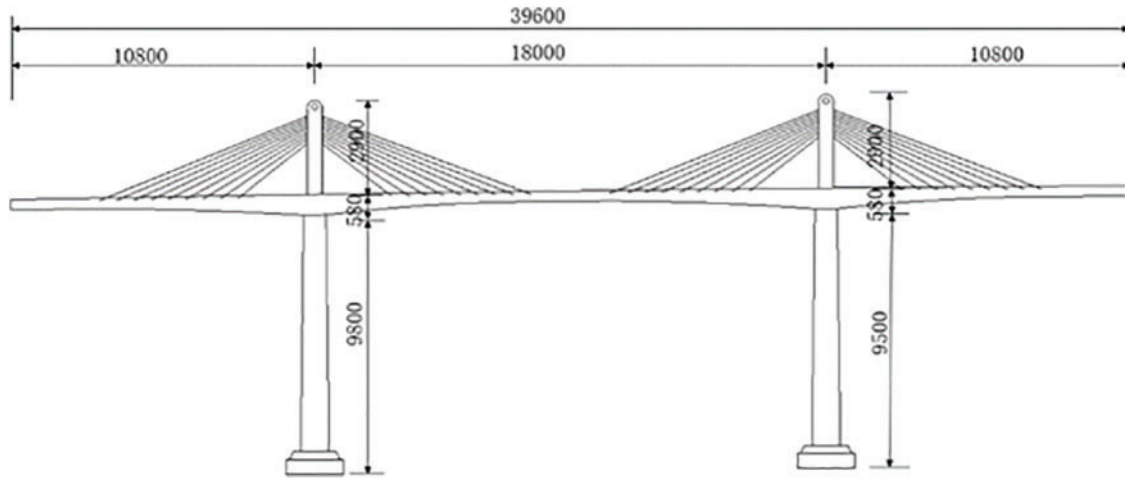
Elevation of the cable-stayed bridge (unit: cm)
